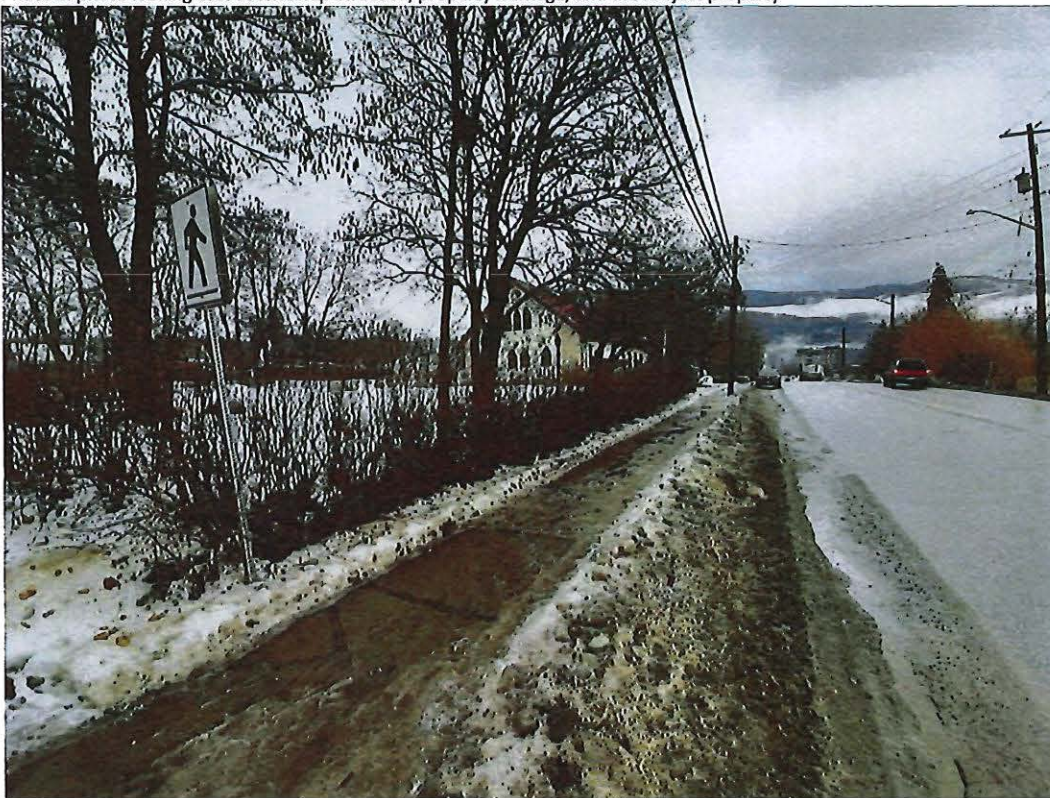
photo looking south down subject property frontage and Shuswap Street SE
